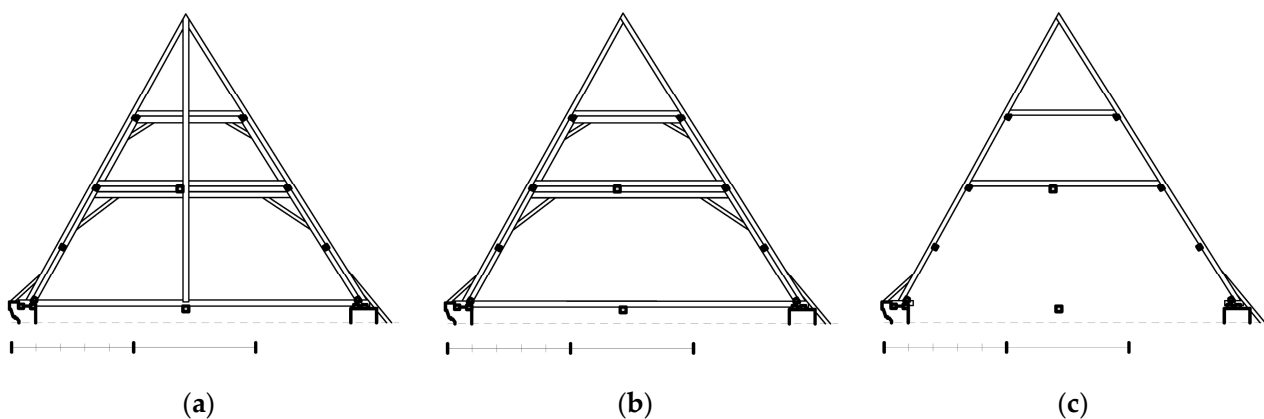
Sighișoara church roof trusses: (a,b) main trusses; (c) secondary truss.
